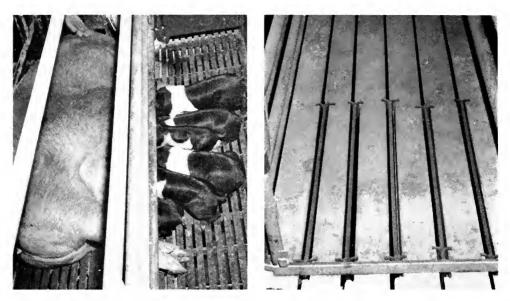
Totally slotted floors with steel slats (left) and concrete slats (right). The steel slats are 1 inch wide with $\frac{1}{2}$ -inch spacings between slats; the concrete slats are 3 inches wide with $\frac{1}{2}$ -inch spacings except at the rear of the pen, where spacings are wider (foreground). The iron rods are removed as soon as the pigs are old enough to cope with the wider openings.
